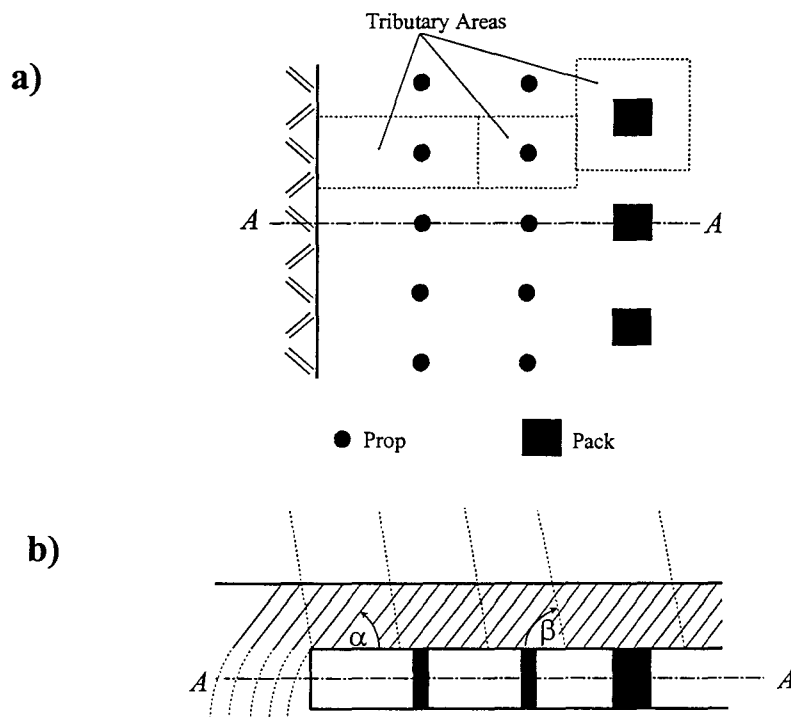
a) Plan view applied for tributary area load requirements (top), and b) face perpendicular cross-section used to determine maximum stable hangingwall spans in strike direction (bottom).
